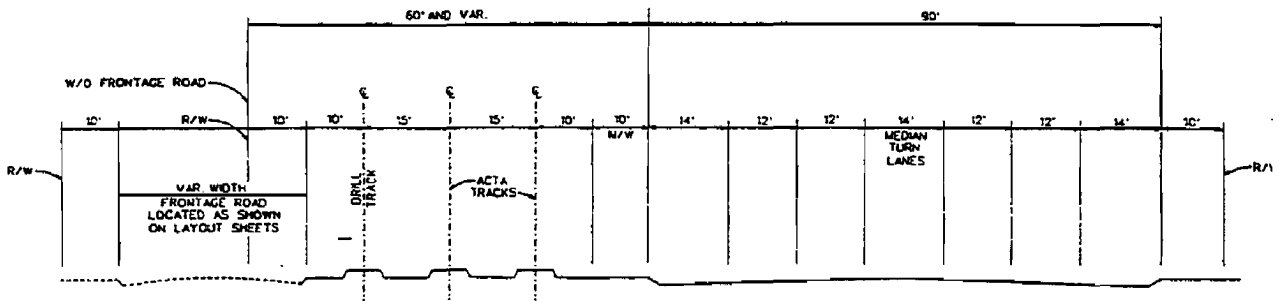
illustrates the typical cross sections that would be used in this alternative.
